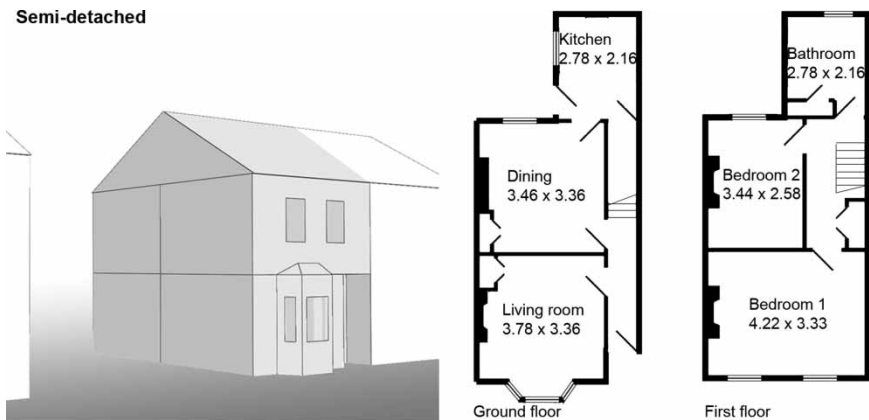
Perspective image, site plan and floor plans of the garden city-type suburb (GCS) semi-detached home. Source: plans redrawn from Rightmove (2011)
